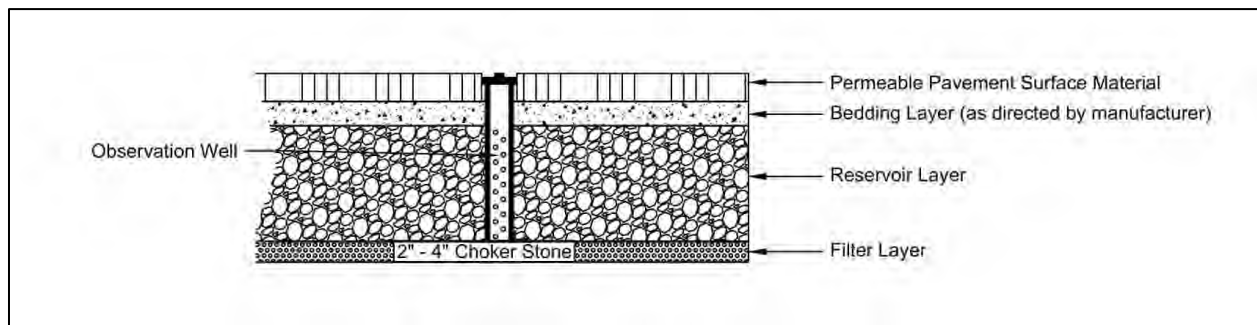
Cross-section of an enhanced permeable pavement design without an underdrain.
